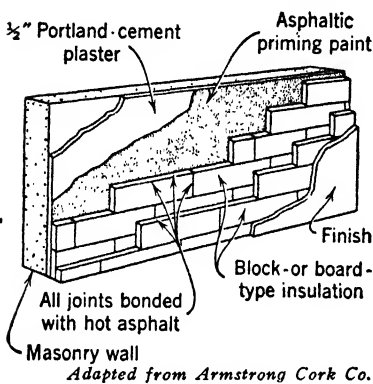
The usual method of applying block- or board-type insulation to a masonry wall.
